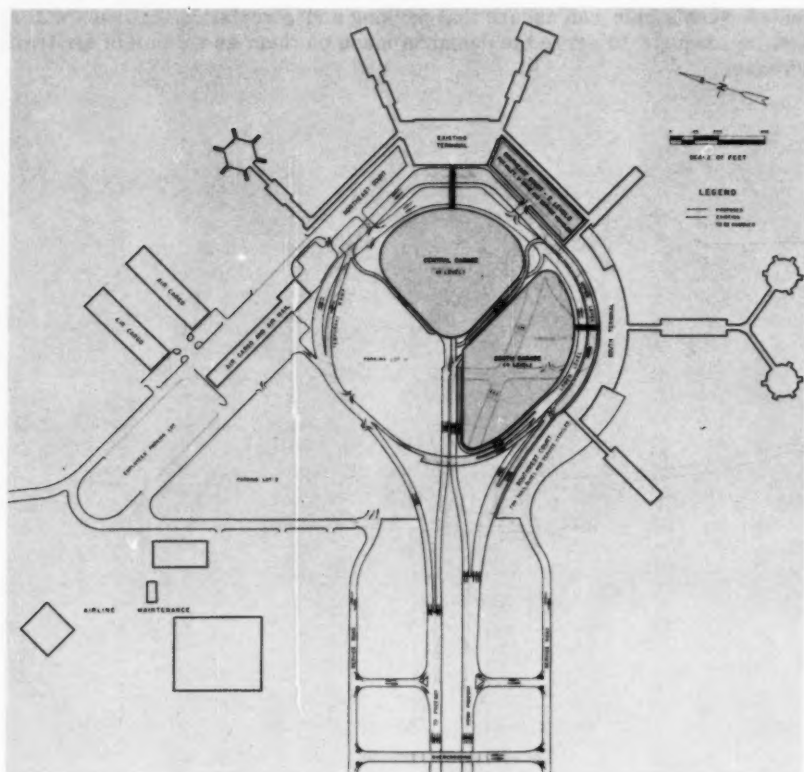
SECOND STAGE PLAN OF TERMINAL AREA
